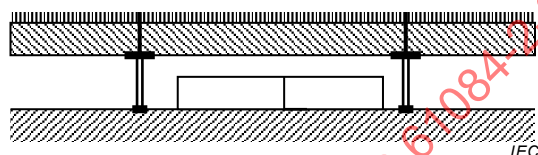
Underfloor CTS/CDS – Installed under a raised floor
